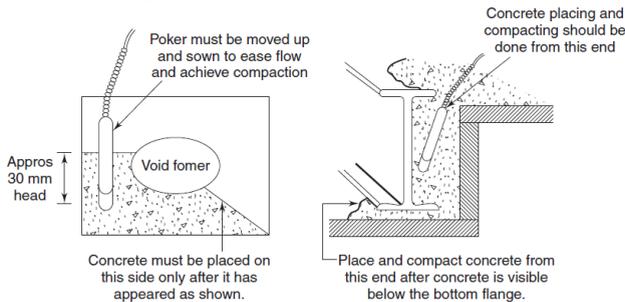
Correct method of placing concrete below a circular or structural Void former
